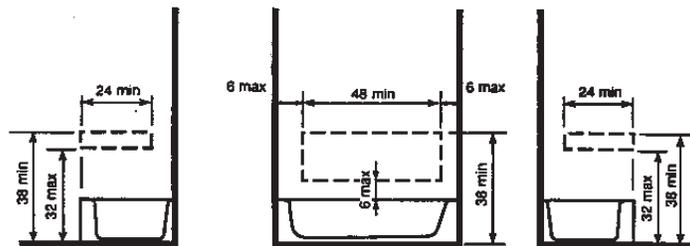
Location of Grab Bar Reinforcements for Adaptable Bathtubs
